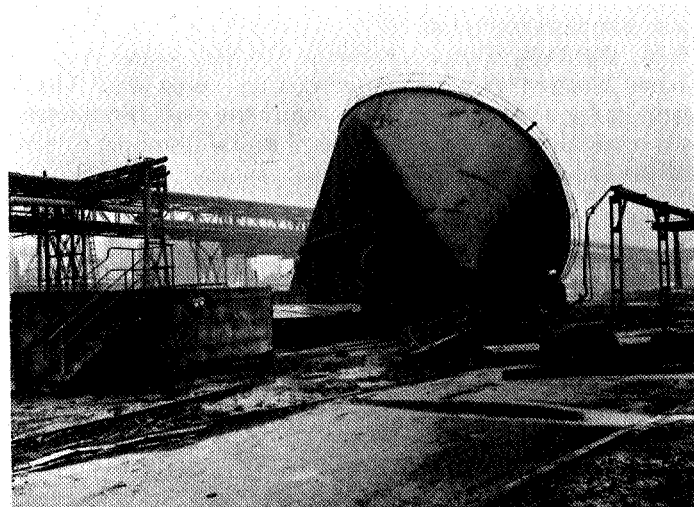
View of failed tank from west of bund, looking southeast, showing demolished sections of the bund wall.
